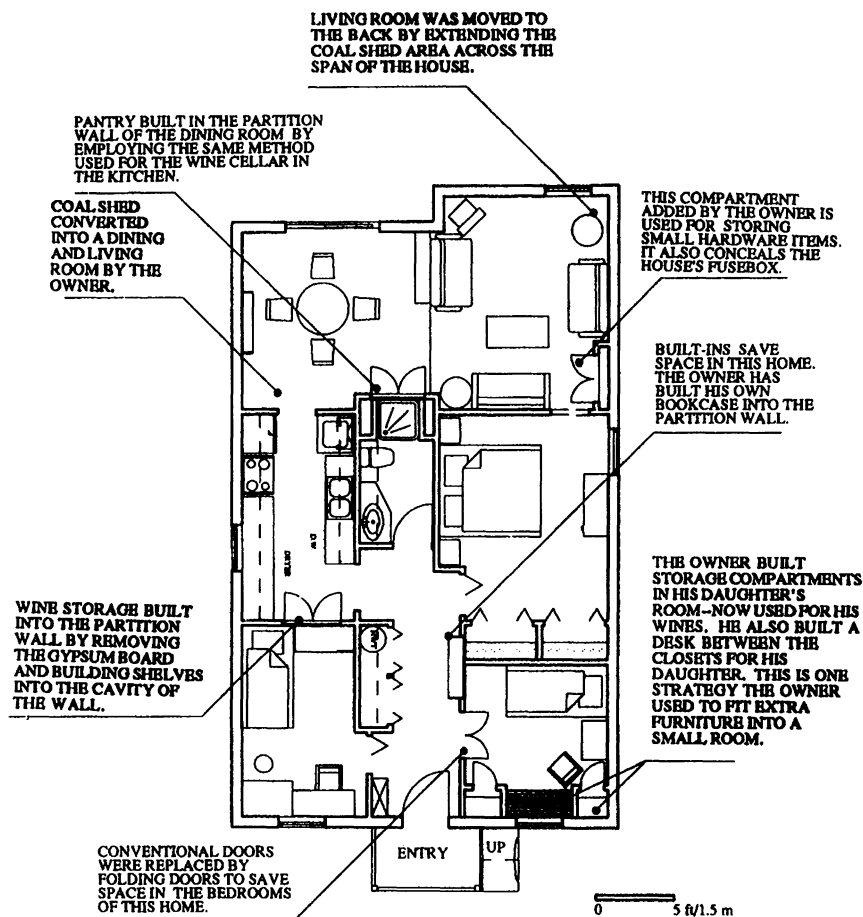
Floor plan of case study 19: living room moved to former coal shed.
